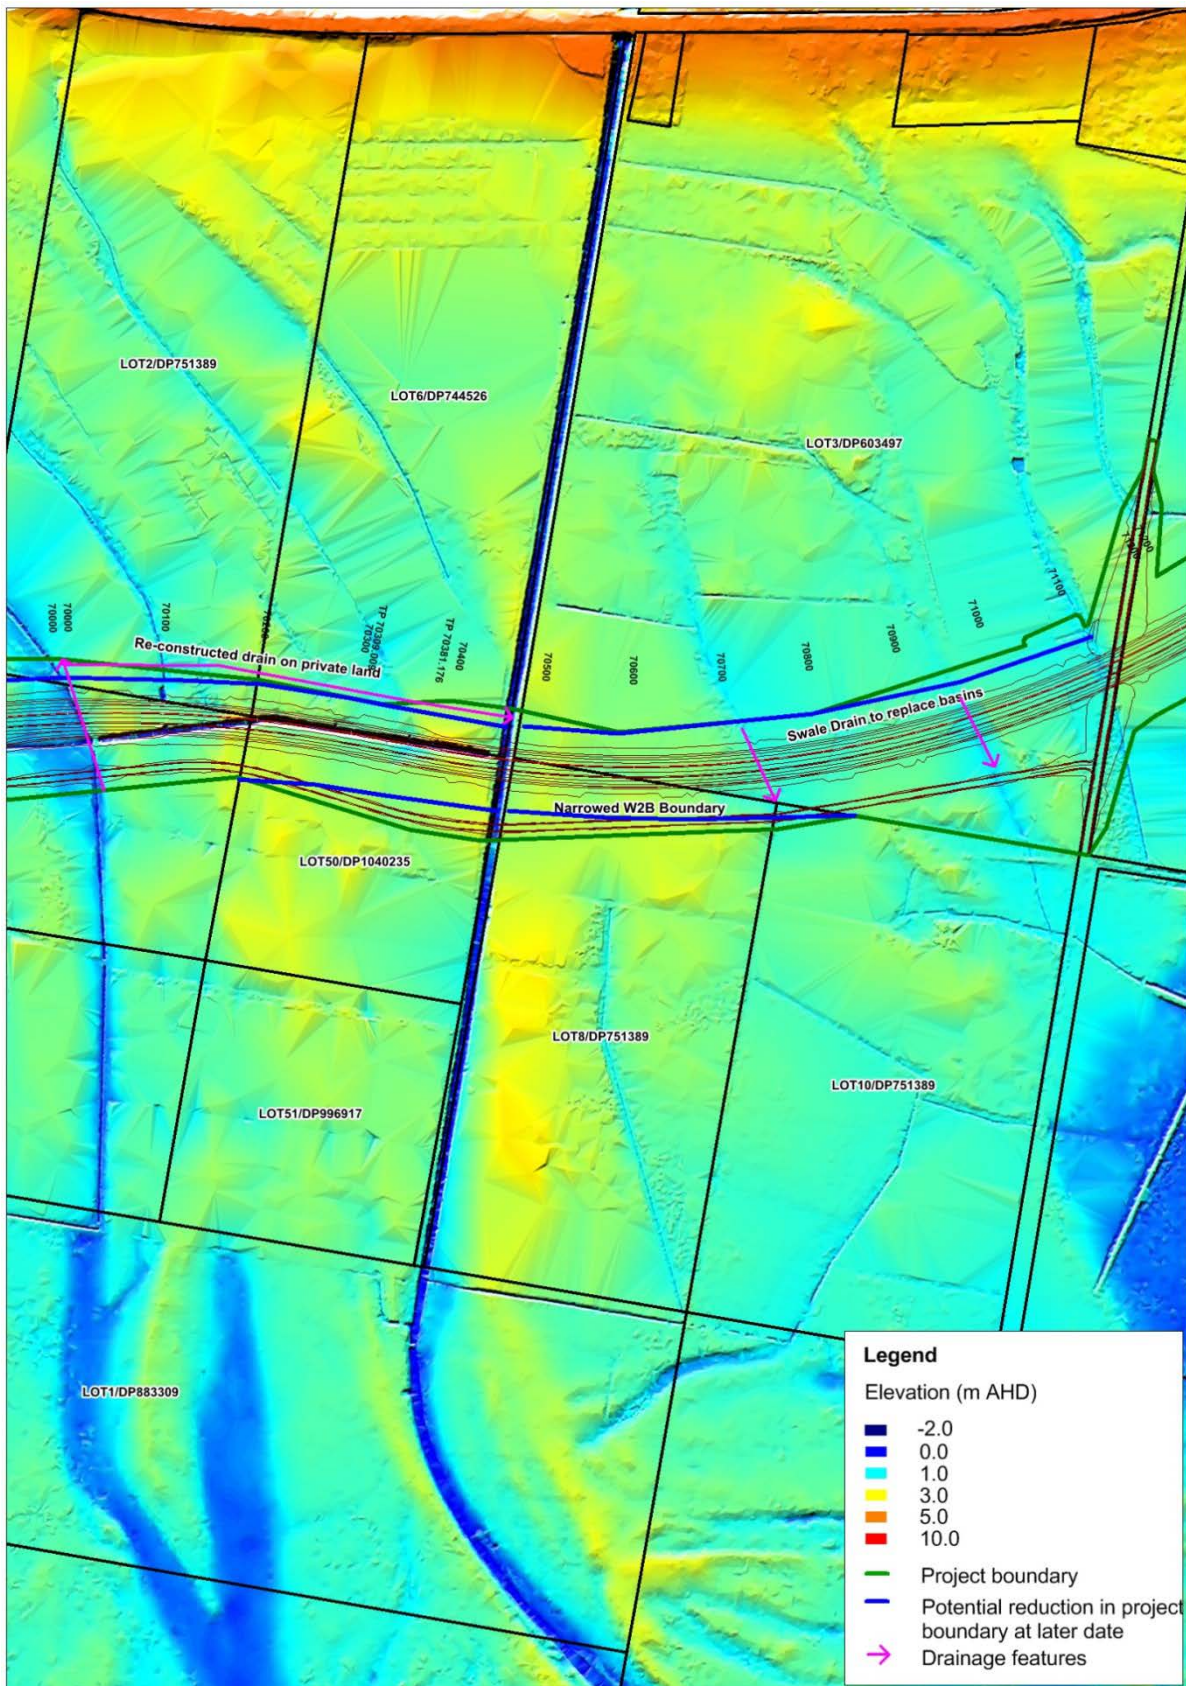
Possible Shark Creek flood and drainage design and upgrade at Crackers Drain with terrain
